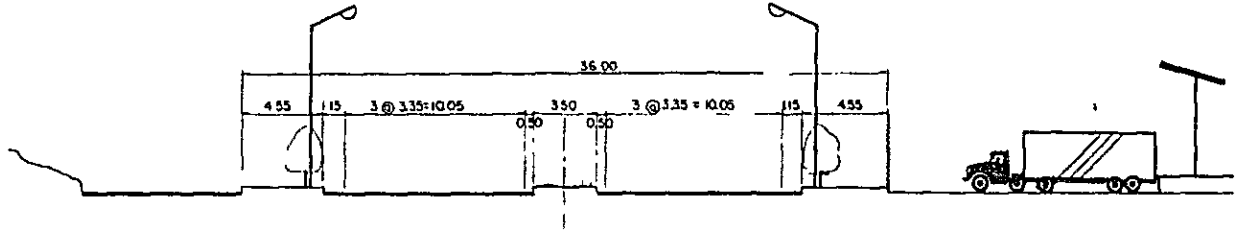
WIDENED CROSS SECTION OF VIA CERRO ANCON(1)
